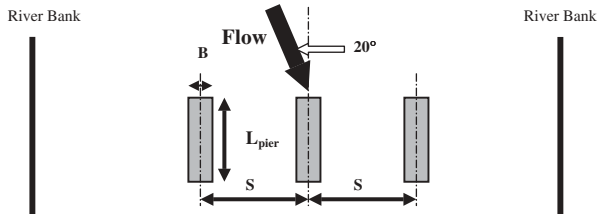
Plan view of rectangular piers group scour case (Example 3).
